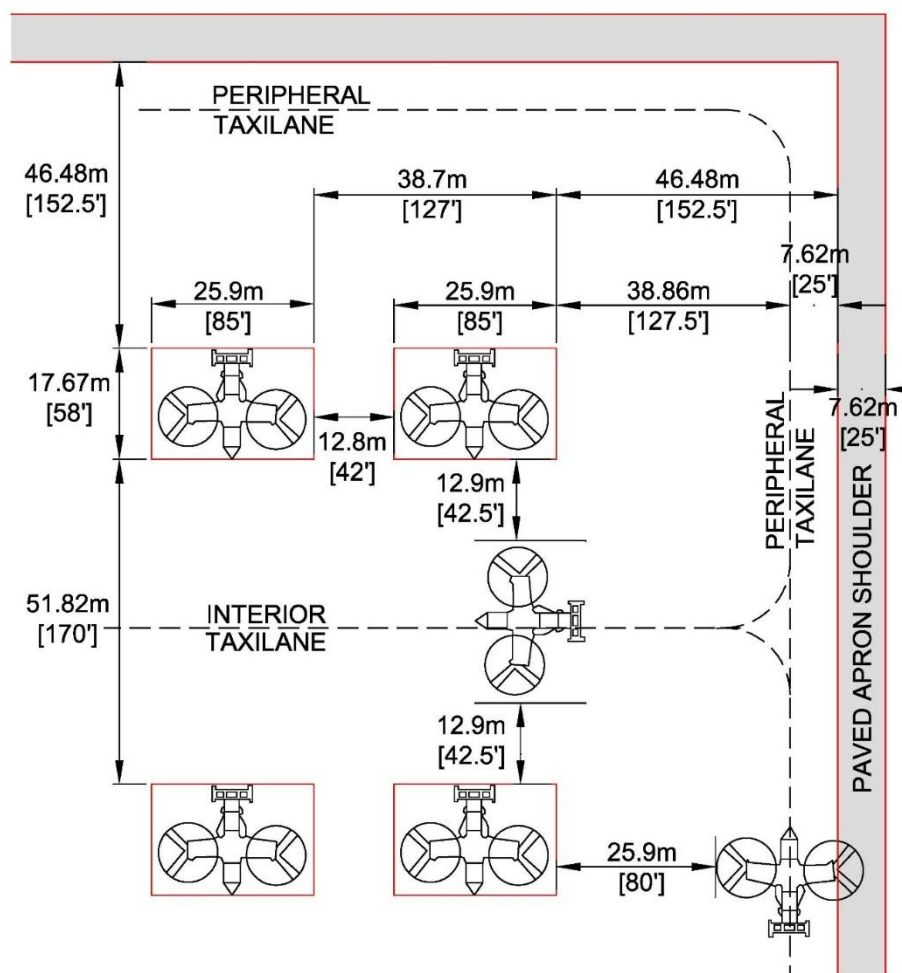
provides parking block dimensions as well as peripheral and interior taxiway clearance requirements. The V-22 Parking Block will not overhang the apron shoulder.
